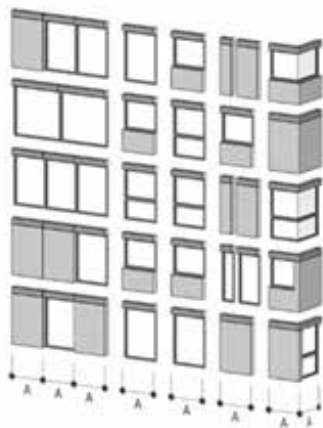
Façade panel library and apartment options. Source: (Author 2017)
